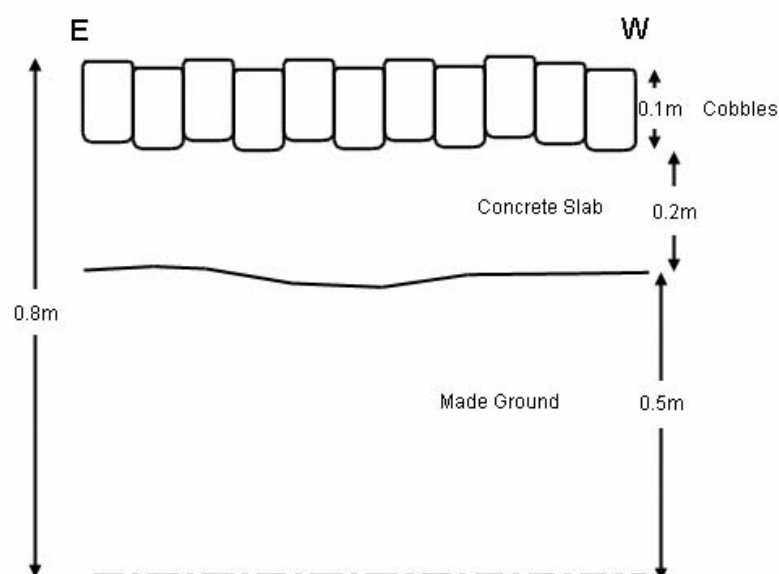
The north facing sketch section at the eastern end of Pennington Street (Scale: 0.6m)
